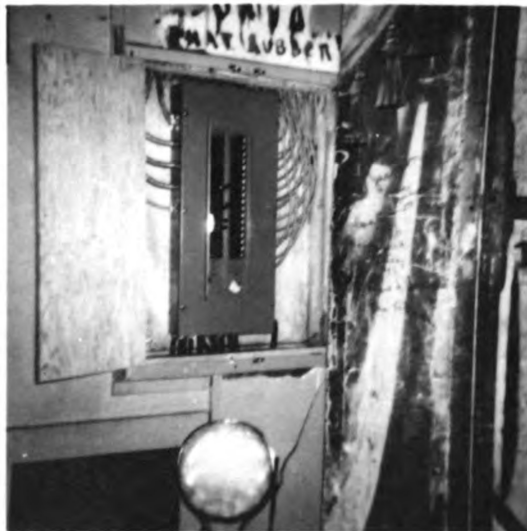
The new lighting control panel installed in the Opera House in 1961
